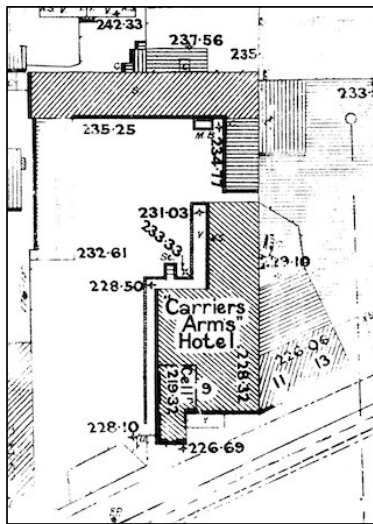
An extract from a sewerage plan showing the subject site in 1926. The hotel and rear stables are of brick (diagonal hatching) while a since-demolished woodshed abutting the stables was of timber (straight hatching). (Source: Ballarat Sewerage Authority, Detail Plan No. 4, 1926).
